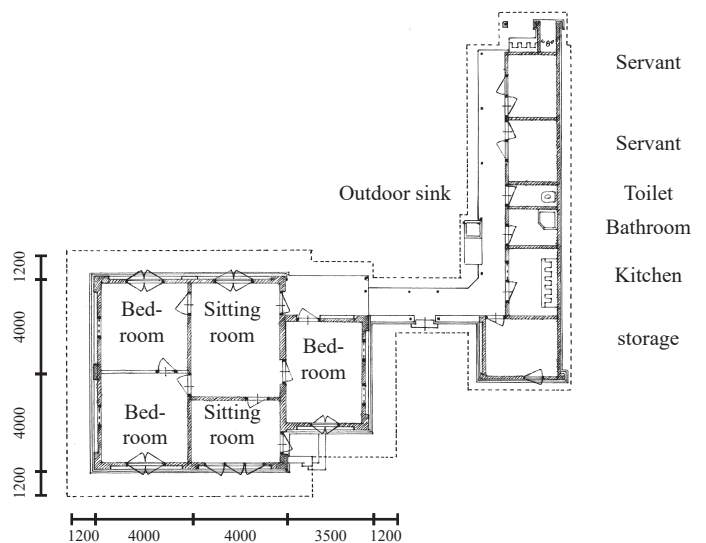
Floor plan European house (De Bruijn, 1927, P.92)
